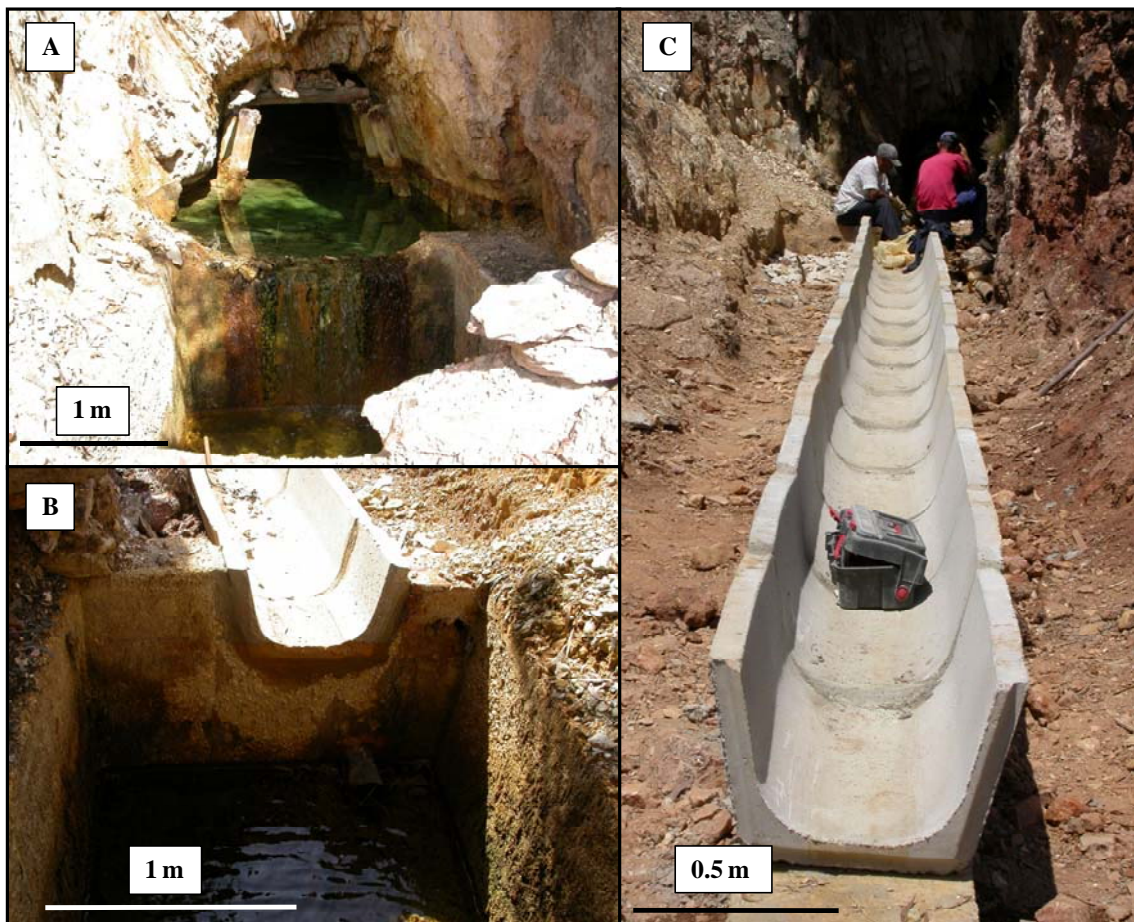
A) Adit. B) Connection between the adit and the open channel. C) Construction of the concrete open channel.
